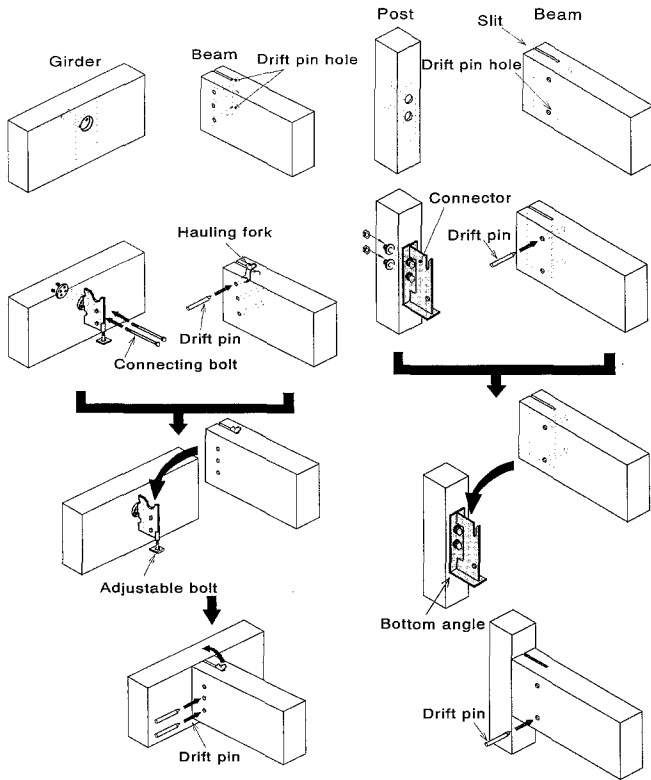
Joint assembly. Post-beam joint with Haratec connector (left) and girder-beam joint with Standard connector (right)
